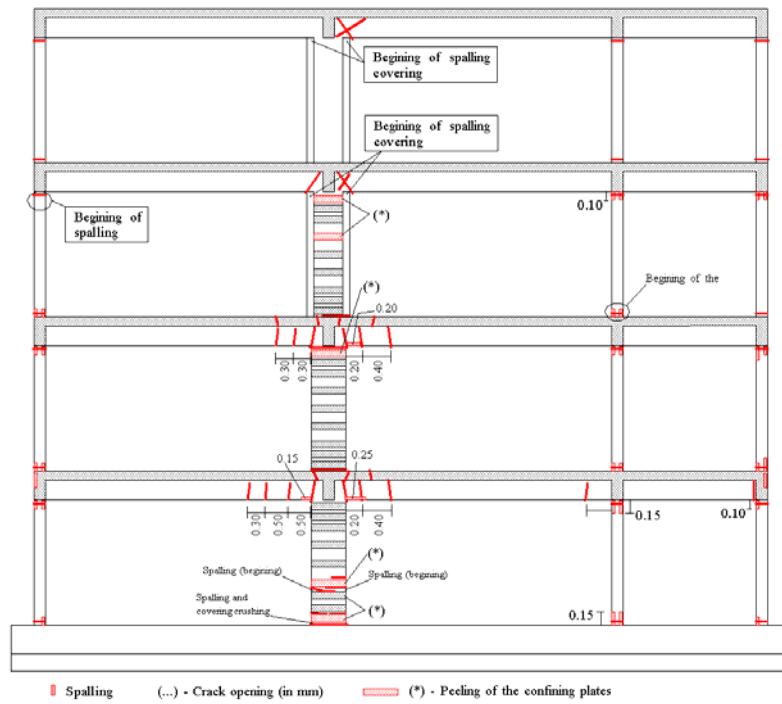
Damage pattern after the selective strengthened frame tests (general layout)
